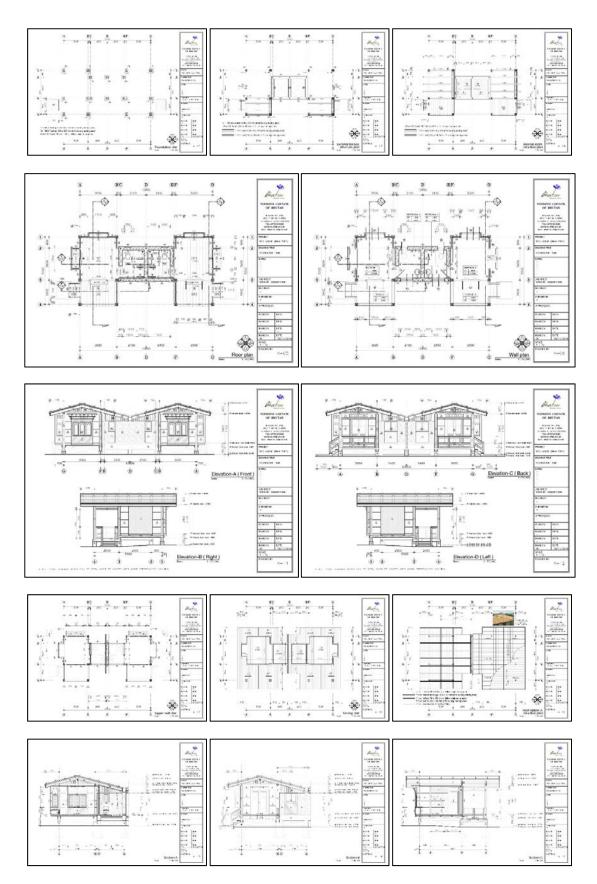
Construction drawings of twin type villa at Manas eco lodge.
